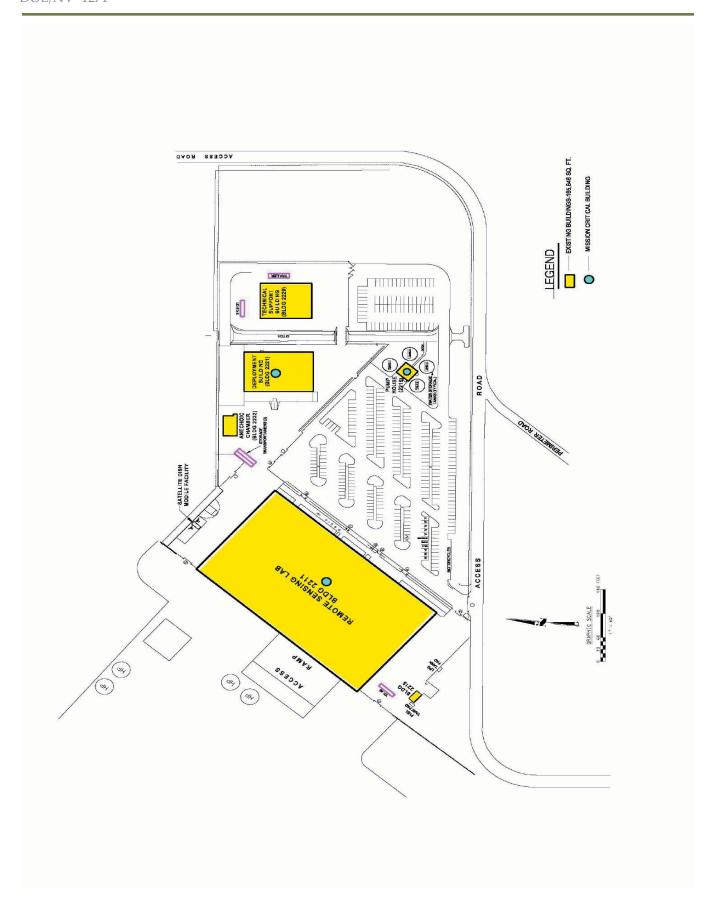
Remote Sensing Laboratory-Nellis Existing Site Plan
